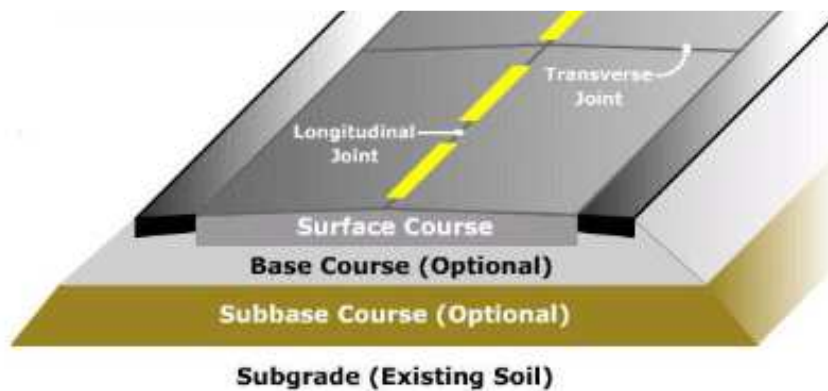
Portland cement concrete(PCC) pavement (Mishra, 2019)
